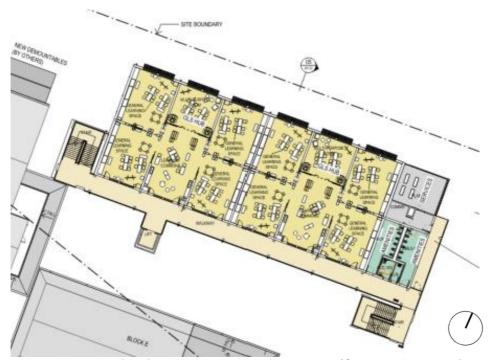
Homebase Indicative Level 1 and 2 floor plan (Source: Pedavoli Architects)
